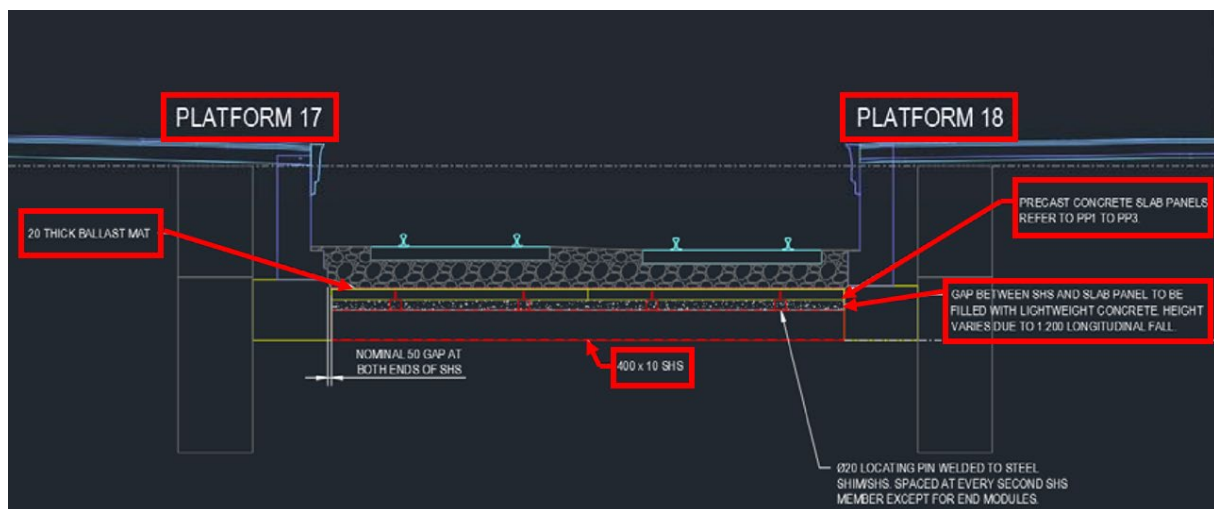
Example of the top down excavation technique for Track Slab construction. Note: SHS run parallel with each other and connect platforms. These are later injected with concrete infill to consolidate the entire track slab structure and allow excavation of the Eastern Concourse underneath.
